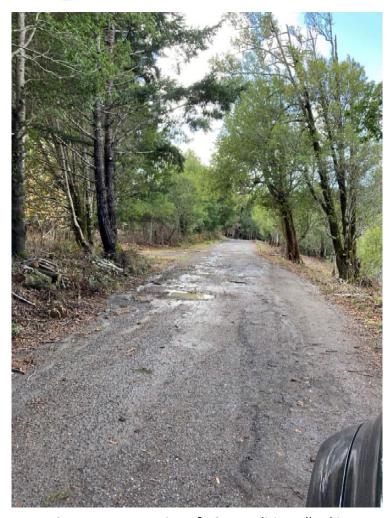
RS1 – Representative of RS1 conditions (looking west). Details asphalt road surface, 20' average road width, crowned geometry and fair road drainage, average slopes <5% - max 10%.
